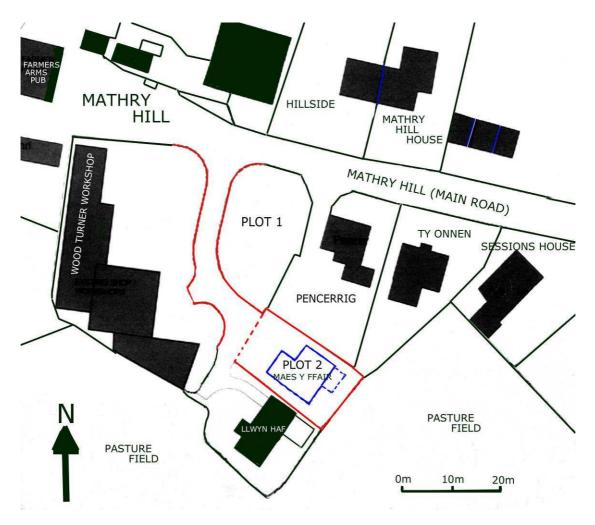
Plan showing location of Plot 2, Maes Y Ffair, area of the watching brief. Based on the client's site plan.
